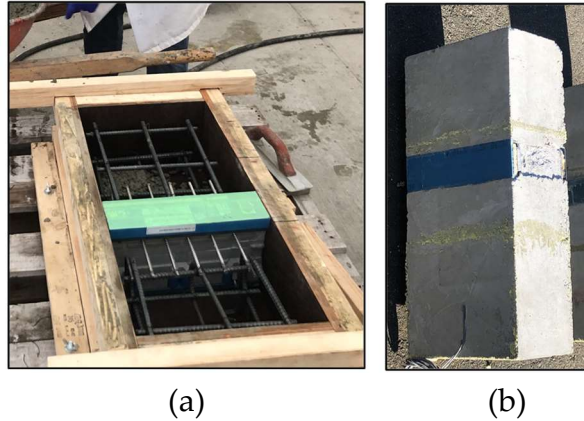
Thermally interrupted slab: (a) Prior to the pouring of concrete; (b) Tested specimen.
